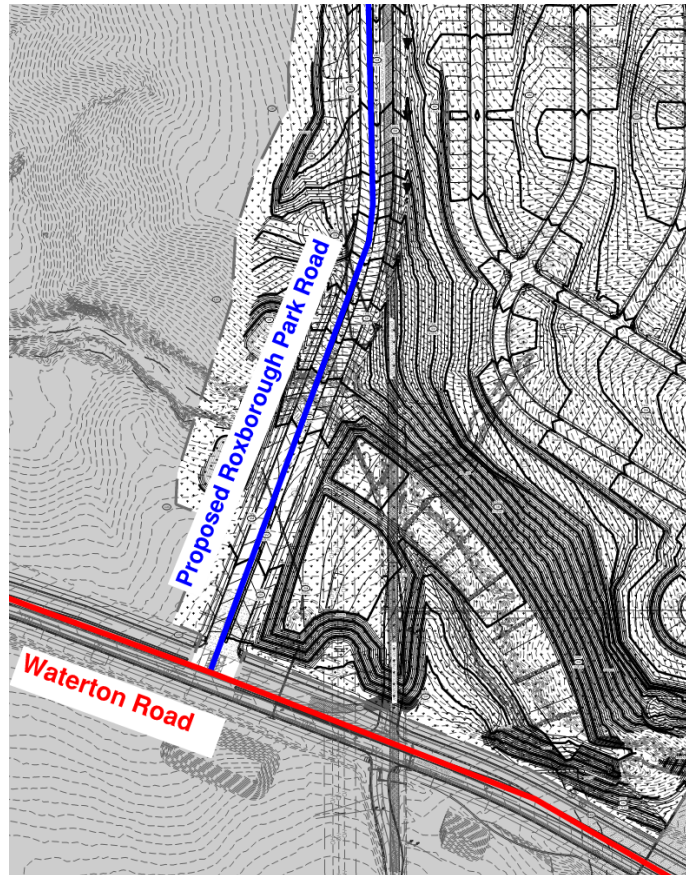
Proposed Re-Alignment of Roxborough Park Road.
